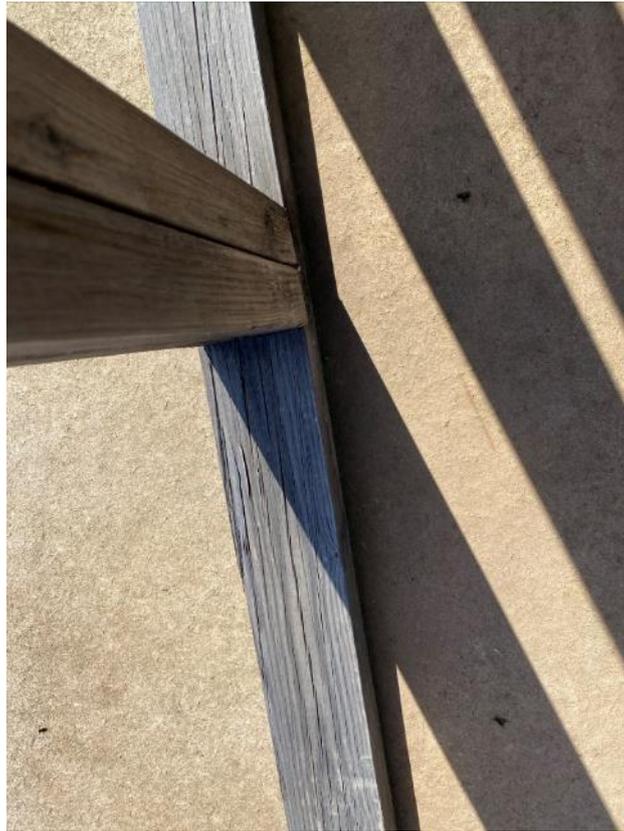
Water damage noted to the timber frame of the first floor wall structure.
